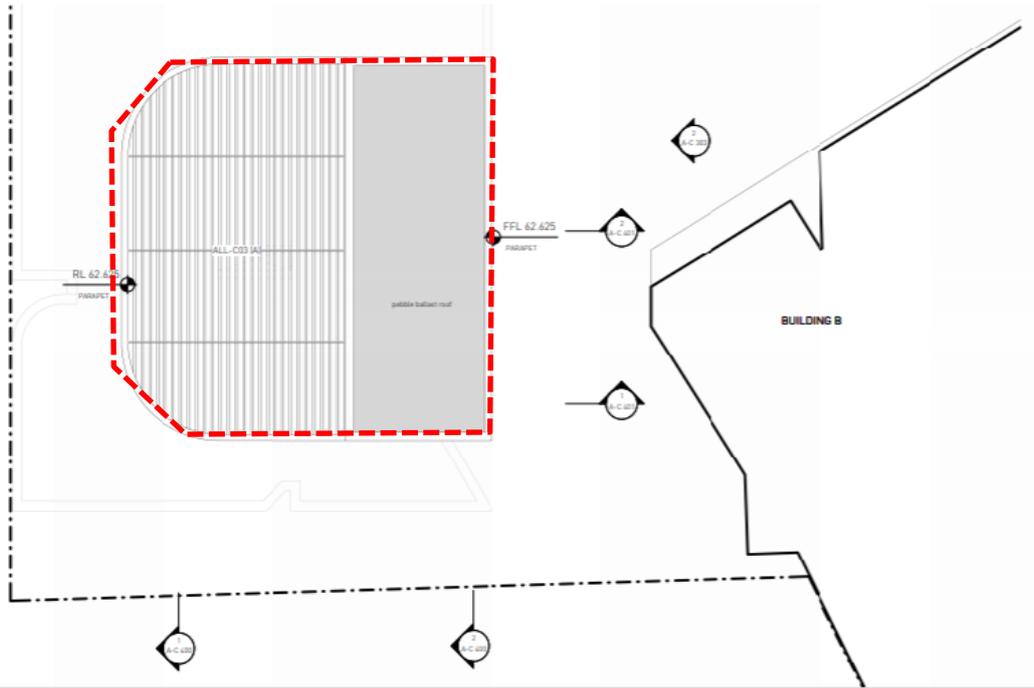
Extent of variation to building height– Building C (shown on roof plan)
